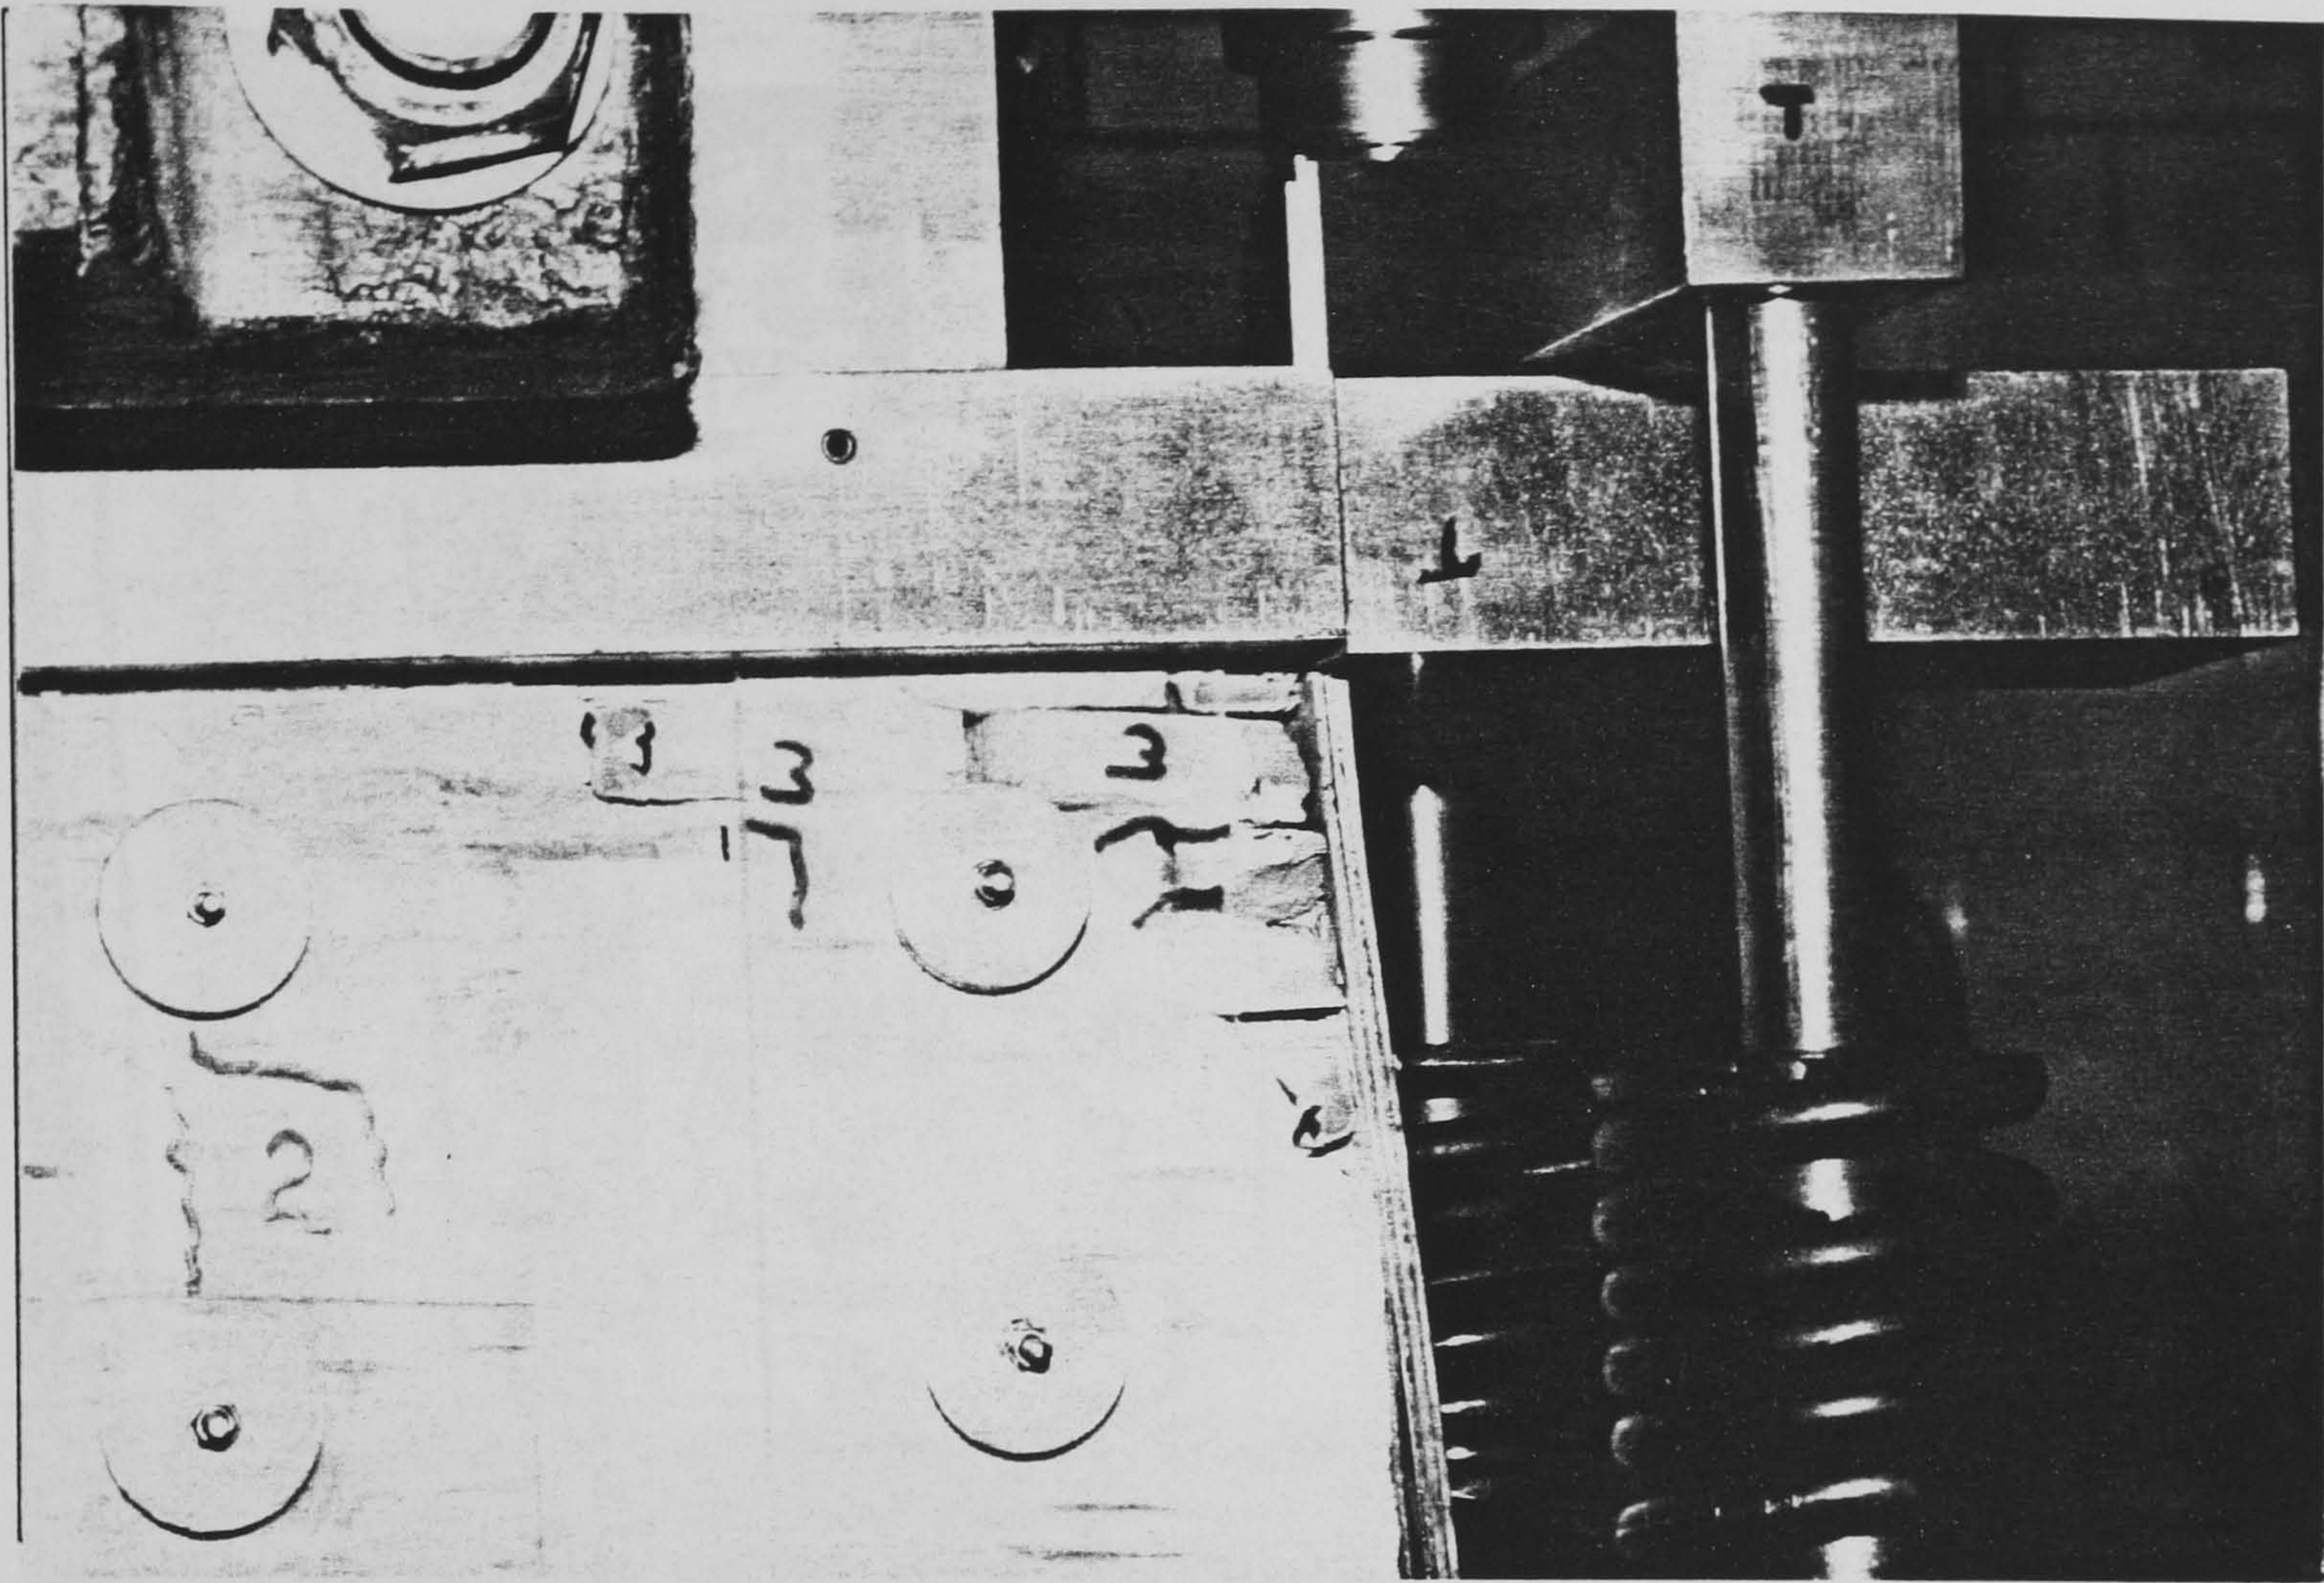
Close-up detail of upper right corner crushing (wall-M)
